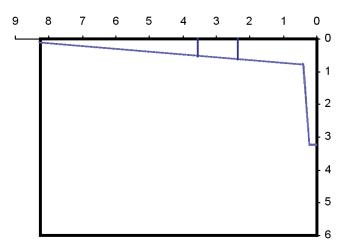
Plan of an original classroom and the new inner wall. Measurements in metres.
